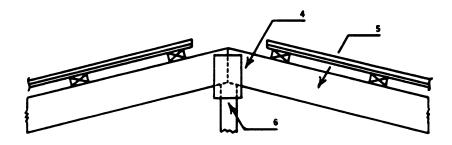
Location of test sites, Barn E. Truss No. 2, 29.2m (104') from north end. North elevation. Flashing, bird netting not shown.
